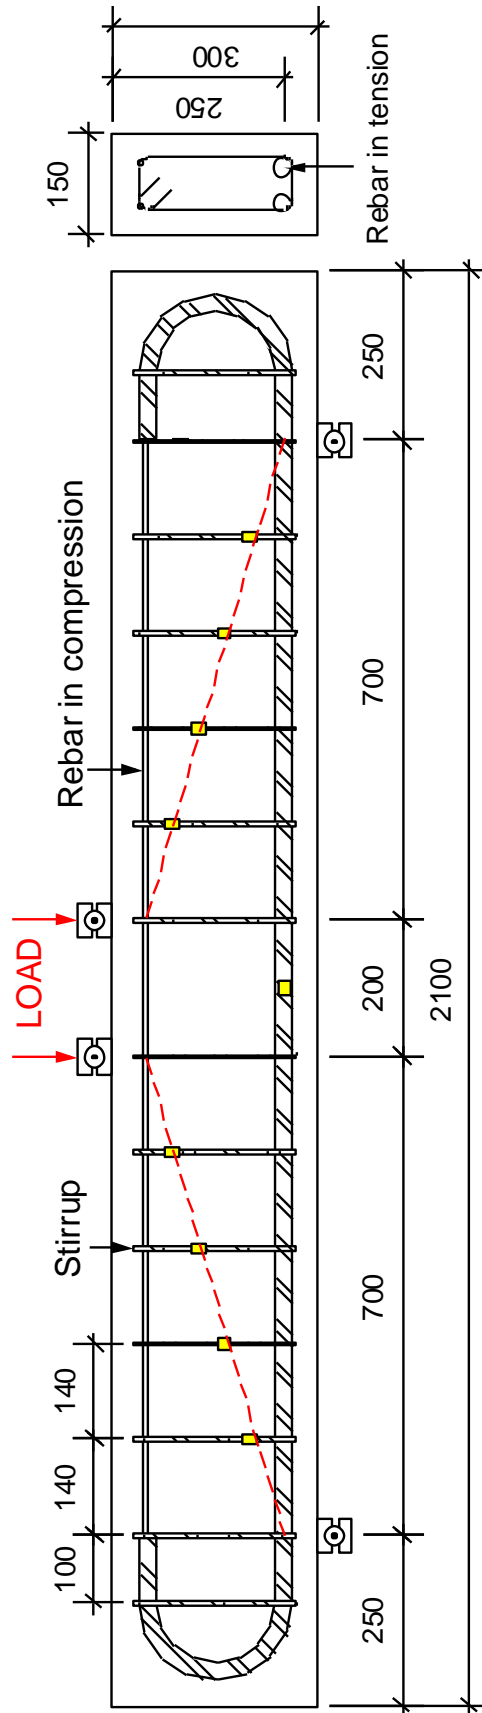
Dimensions and reinforcement details of RE-30.
